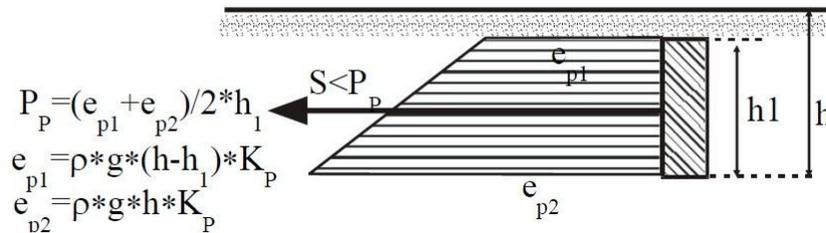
Diagram of passive soil (ground) pressure on the concrete anchor block or wall
